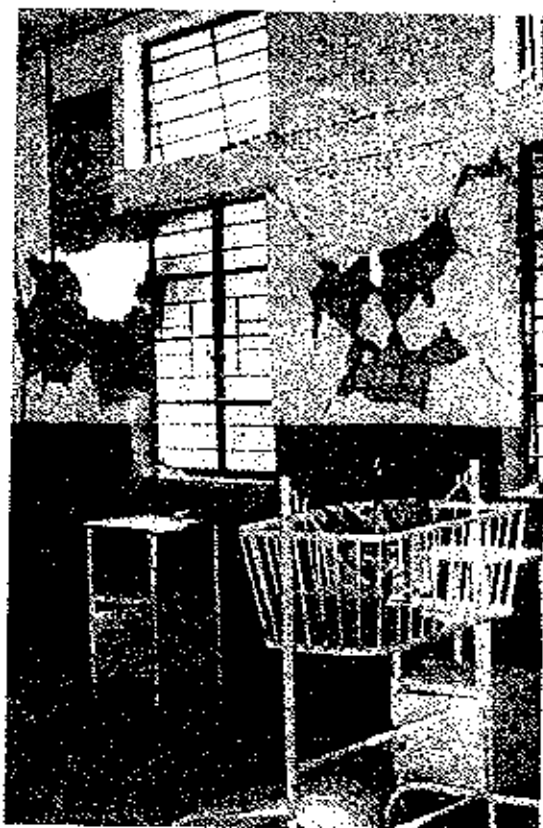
Dr. Bhujbal's clinic at Killari made of stone block masonry.
